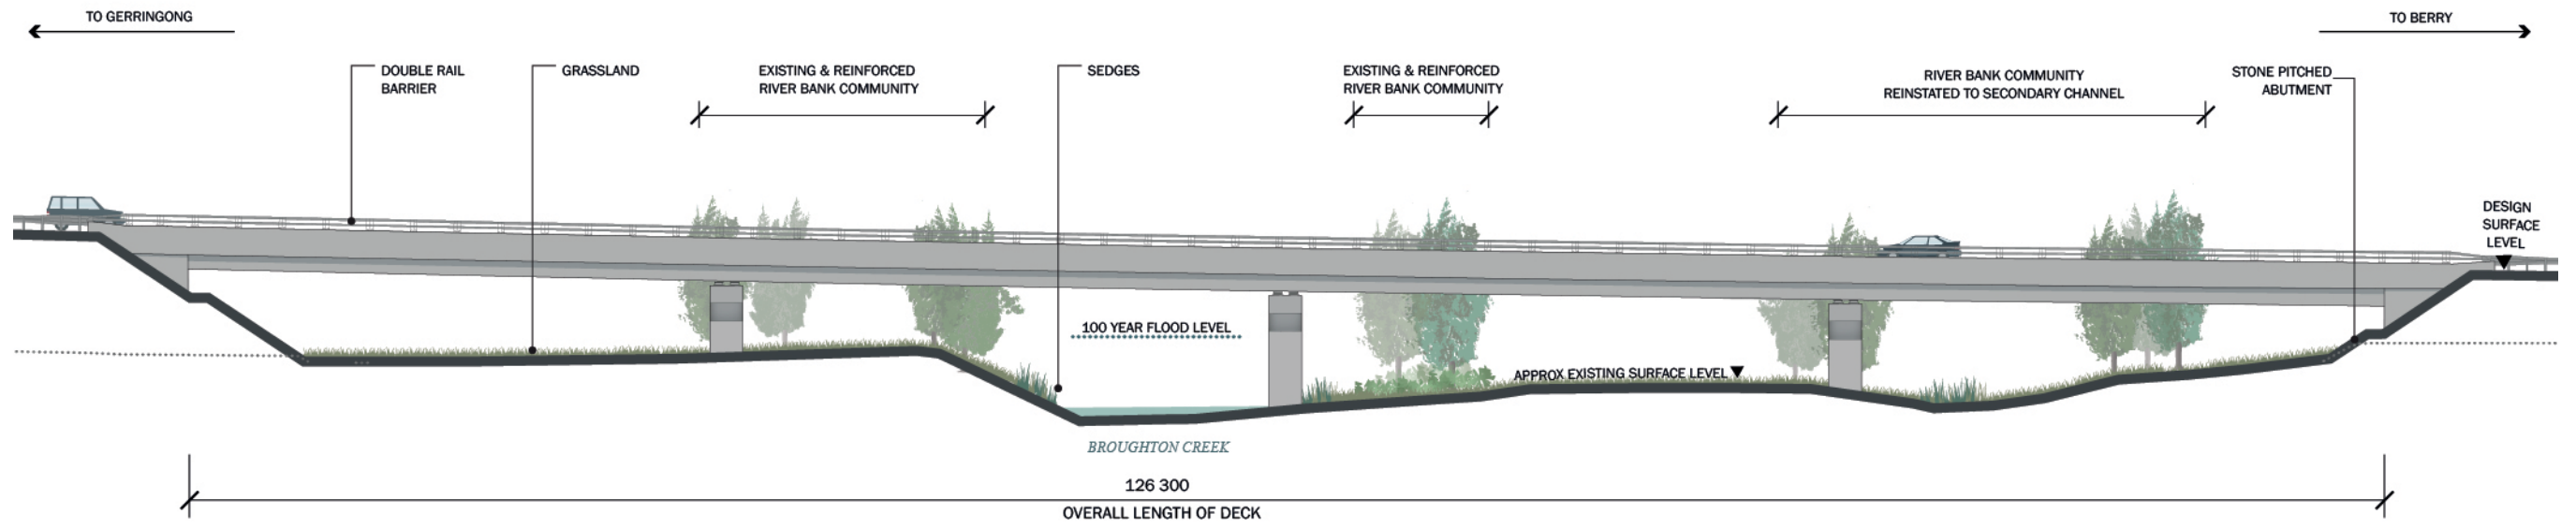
Elevation – Bridge SB02: Broughton Creek Bridge No. 1 (Scale: 1:400@A3)
